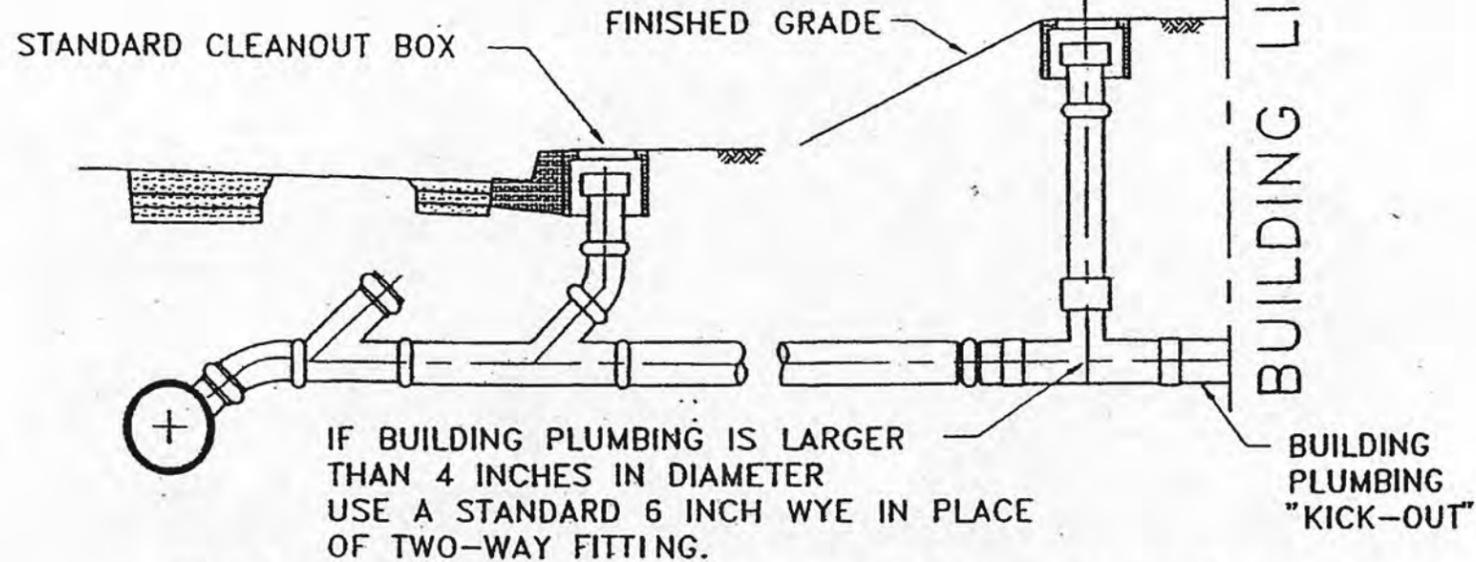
DETAIL - BUILDING SEWER ADJACENT TO BUILDING FOOTING
